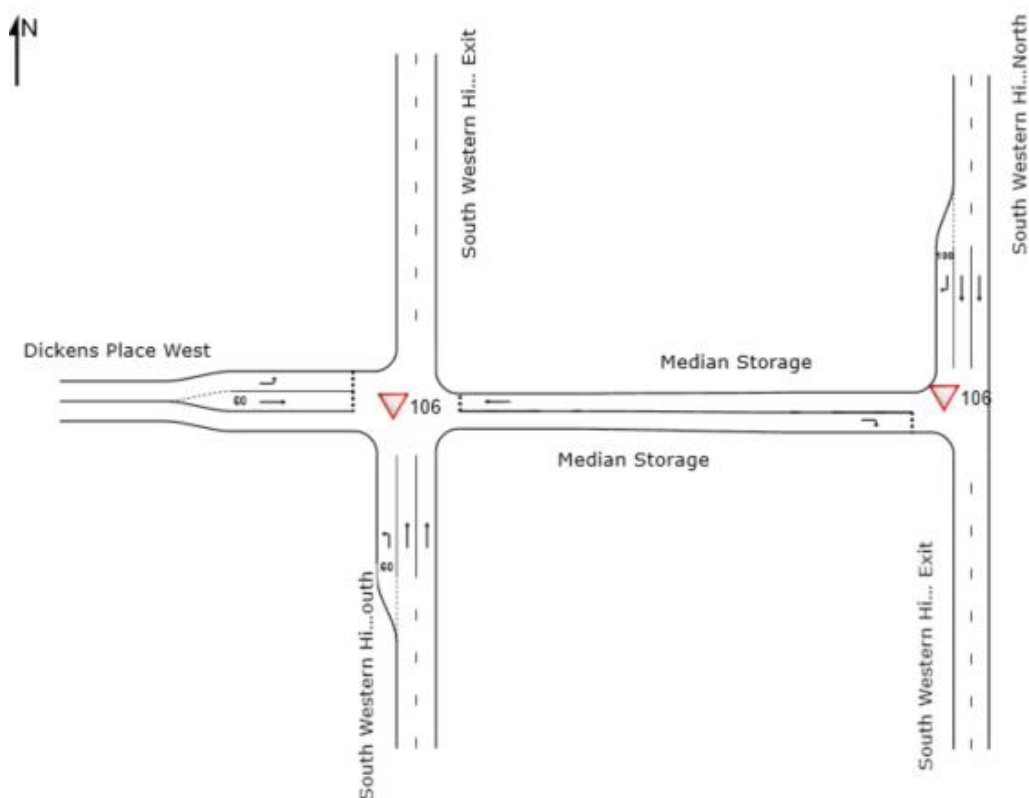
SWH/ Dickens PI – two staged intersection layout – with SWH duplication
